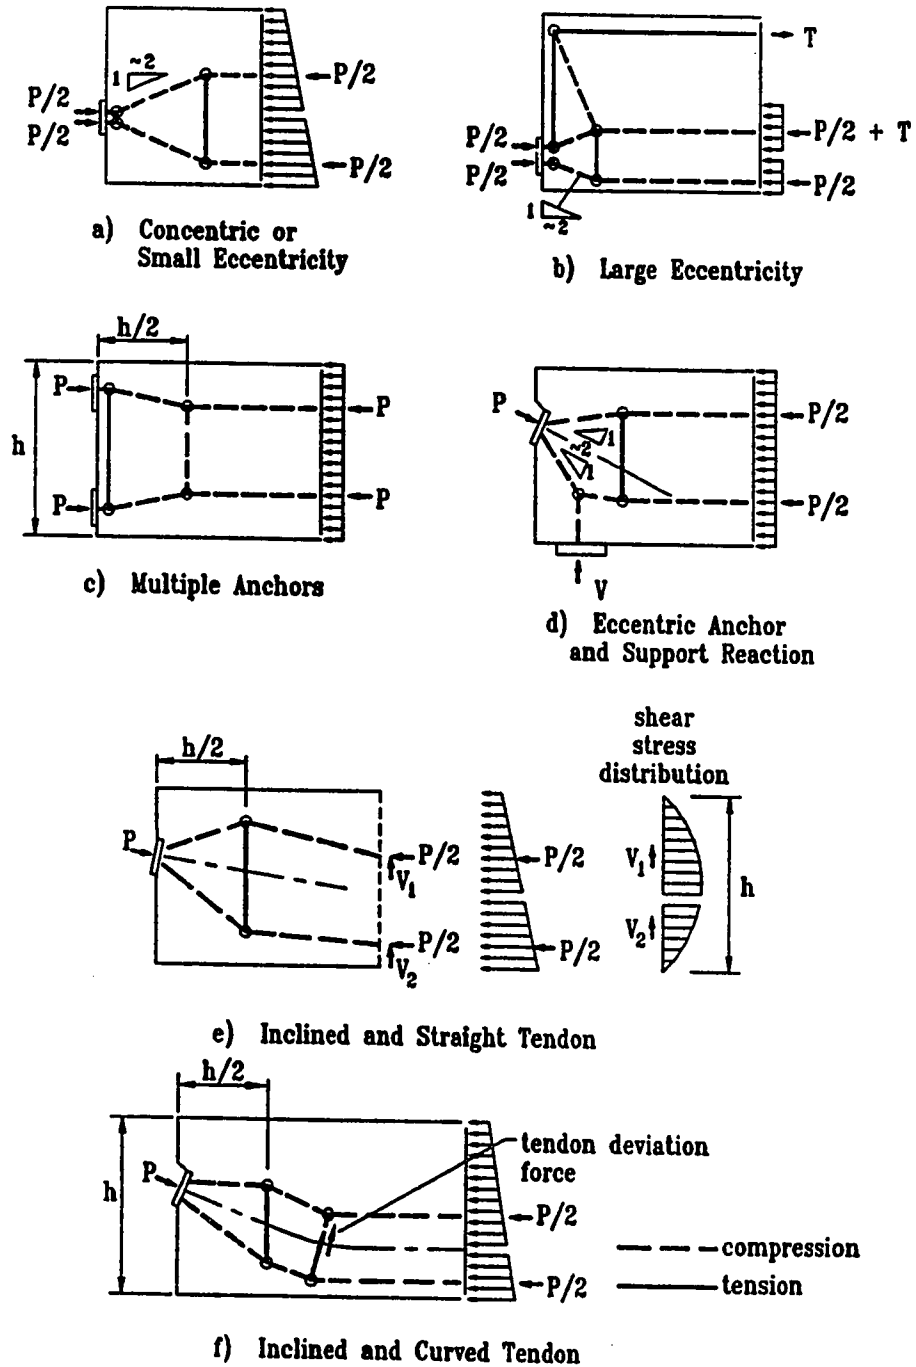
Typical Strut-and-Tie Models for Anchorage Zones
